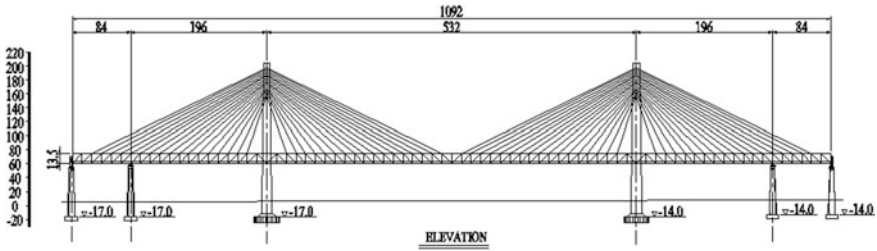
Layout of the cable-stayed bridge (unit: m)
